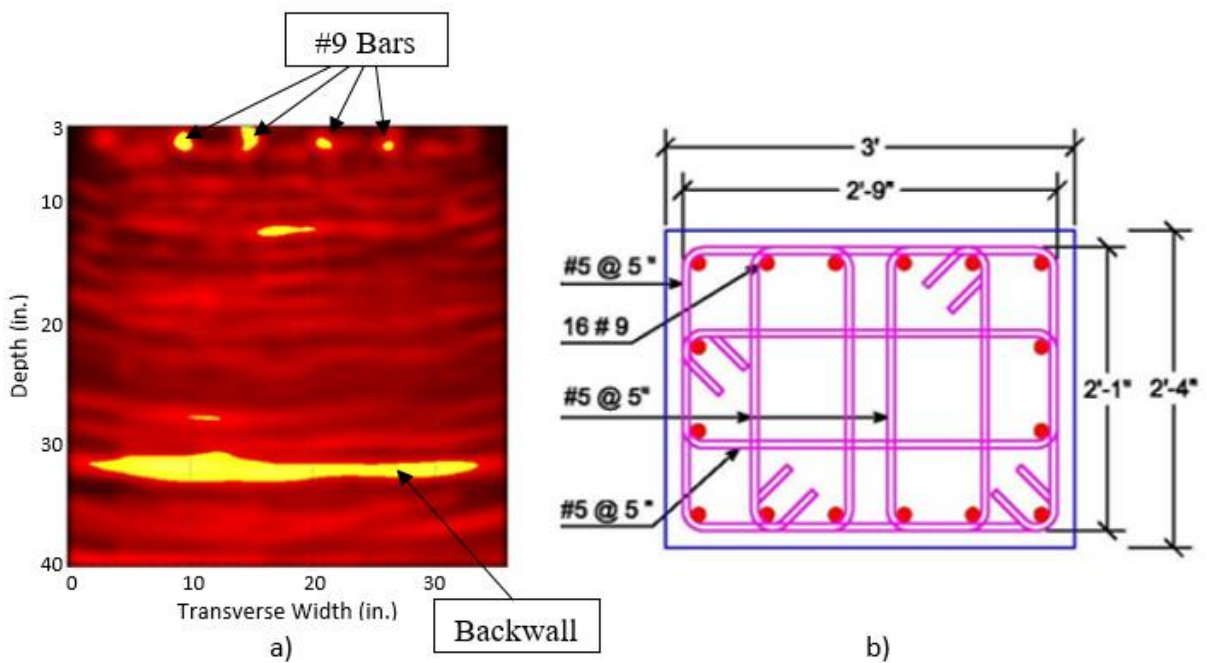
(a) Panoramic reconstructions for 1st measurement showing location of reinforcement and back wall presence, and (b) corresponding design schematic.
